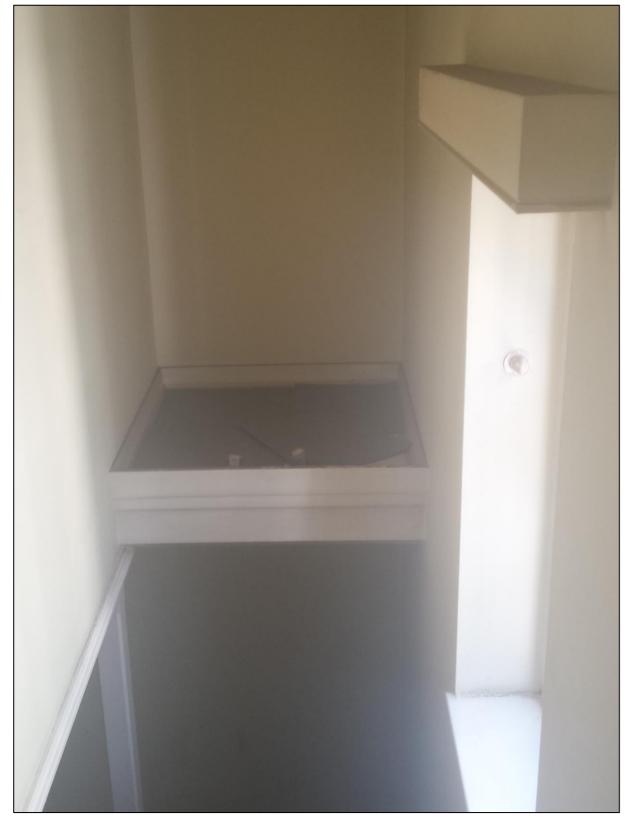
Stairwell area between third and fourth floor - proposed to be boxed in and extended into the adjacent bathroom.
